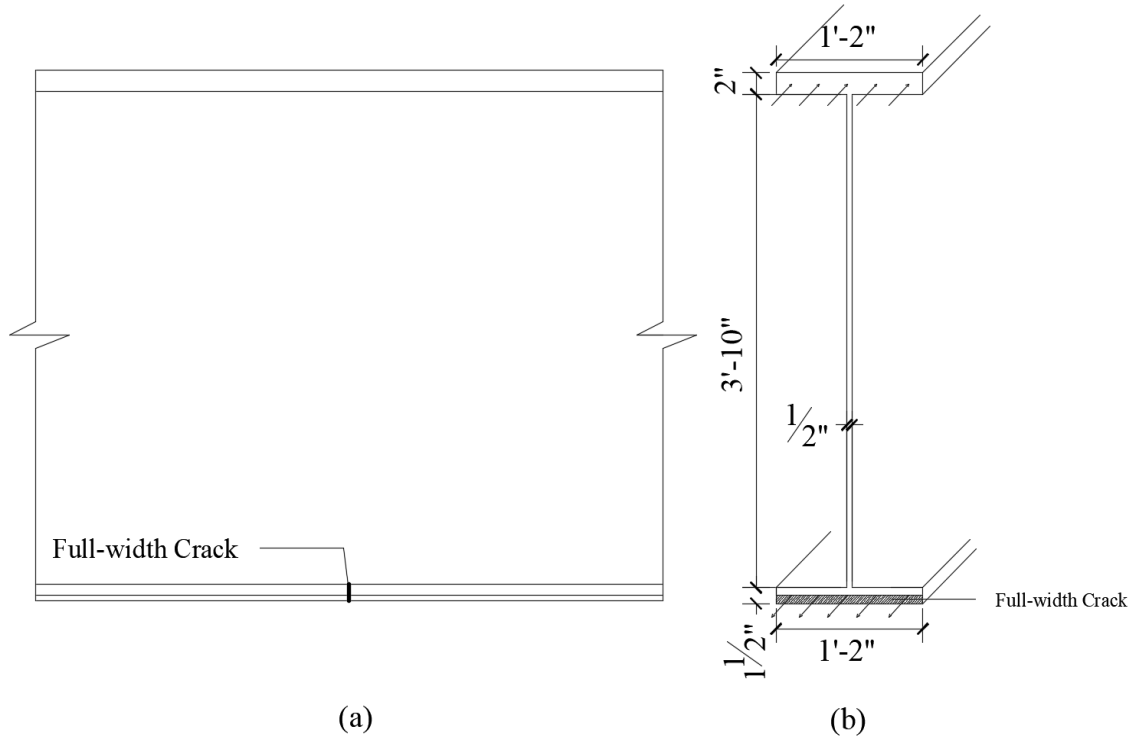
(a) Elevation and (b) Cross-sectional View of a Full-Width Crack Configuration in an I-shaped member
